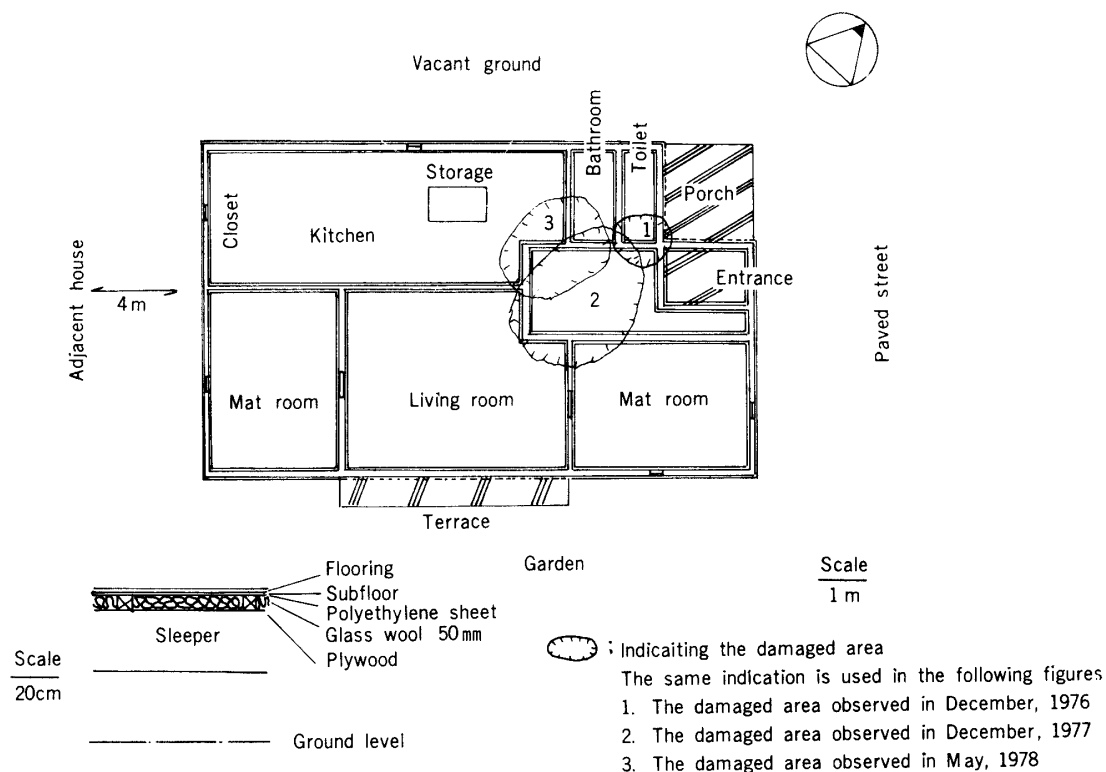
The foundation plan and the details of the floor constitution (Case 1).
